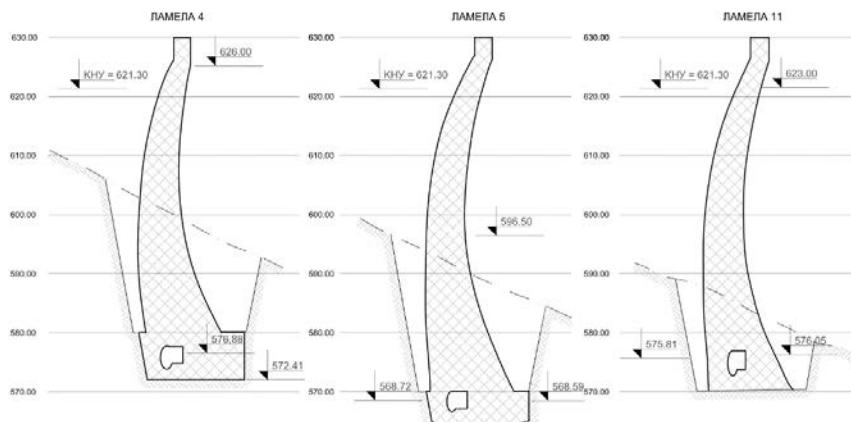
"Vrutci" dam – cross - section of sections 4, 5 and 11
